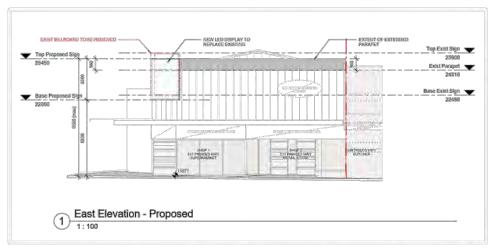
East elevation indicating alterations to parapet and amended siting of signage (Source: Legge & Legge Architects)
